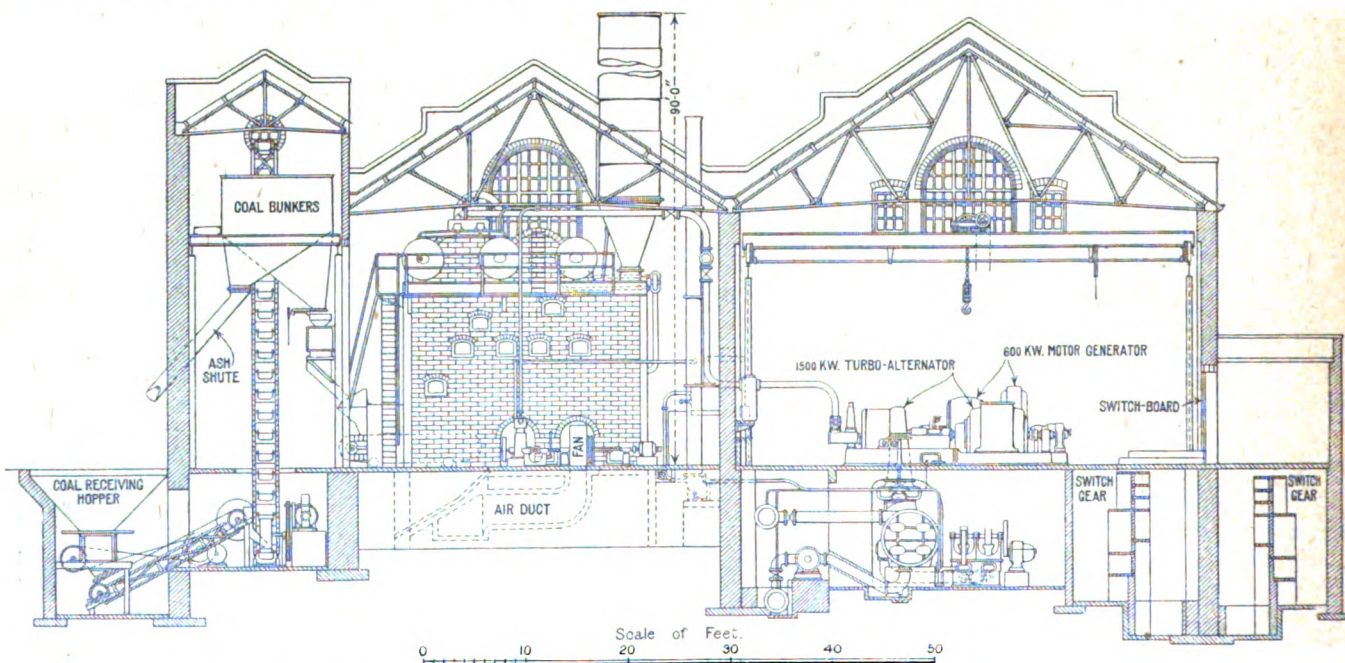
SECTION OF NEW POWER HOUSE THROUGH BOILER HOUSE AND ENGINE ROOM.
